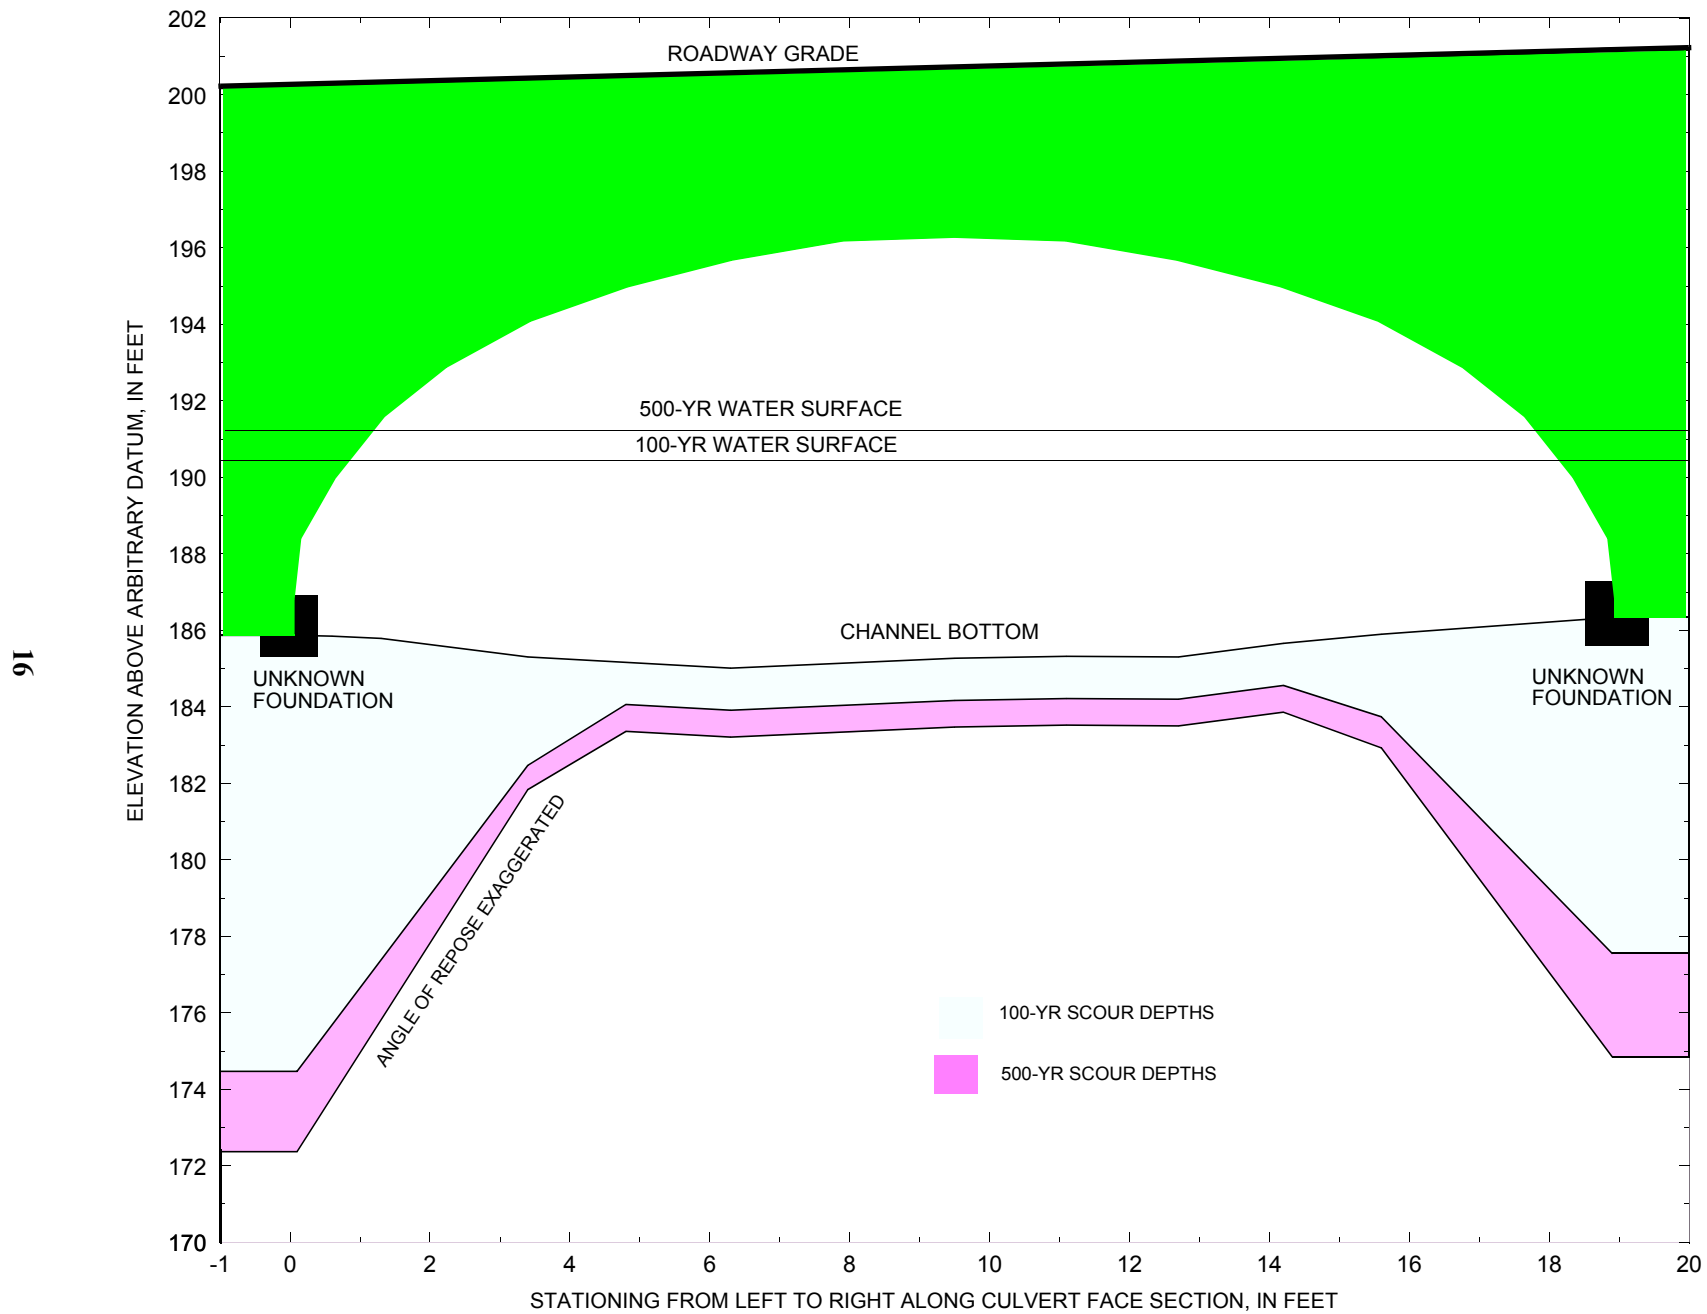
Scour elevations for the 100-yr and 500-yr discharges at structure [BRIDTH0004045B](#) on town highway 4, crossing an unnamed Dailey [Hollow Branch Tributary, Bridgewater, Vermont](#).
